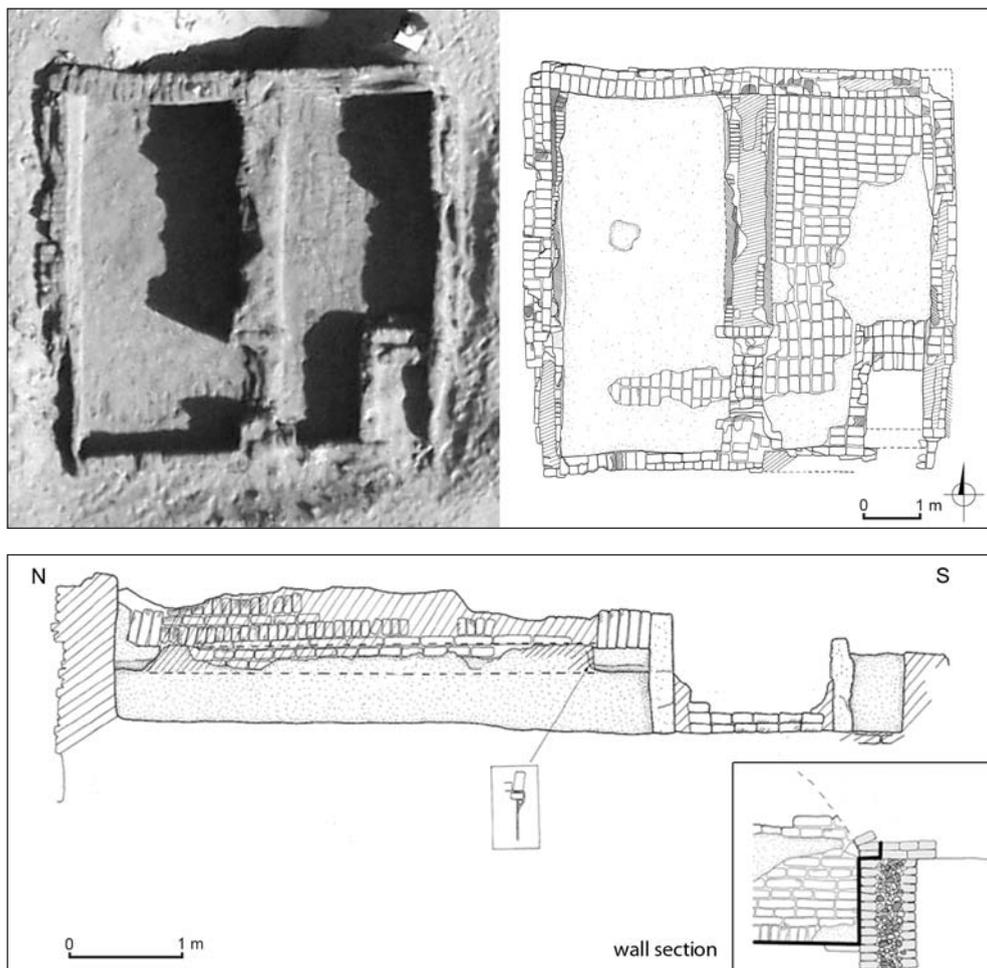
Bird's eye view and plan of the early Christian house excavated at Selib 3 (top); N-S section (looking E); bottom right, section through an outer wall to show construction technique (Drawing K. Molga and B. Żurawski; kite photo B. Żurawski)
